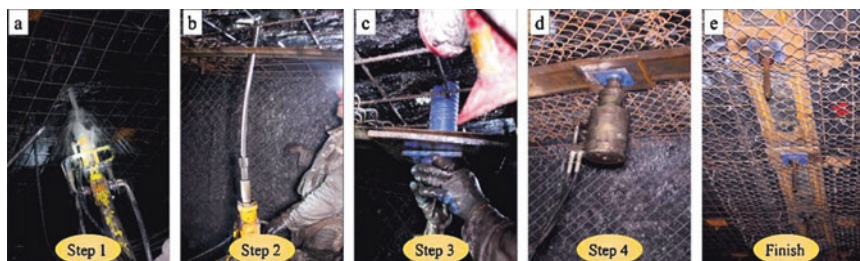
Construction process of the NPR cable: (a) Drilling cable holes; (b) Installing stranded steel rope and anchoring resin; (c) Installing cable accessories; (d) Imposing pre-tightening force; (e) Installing complete
